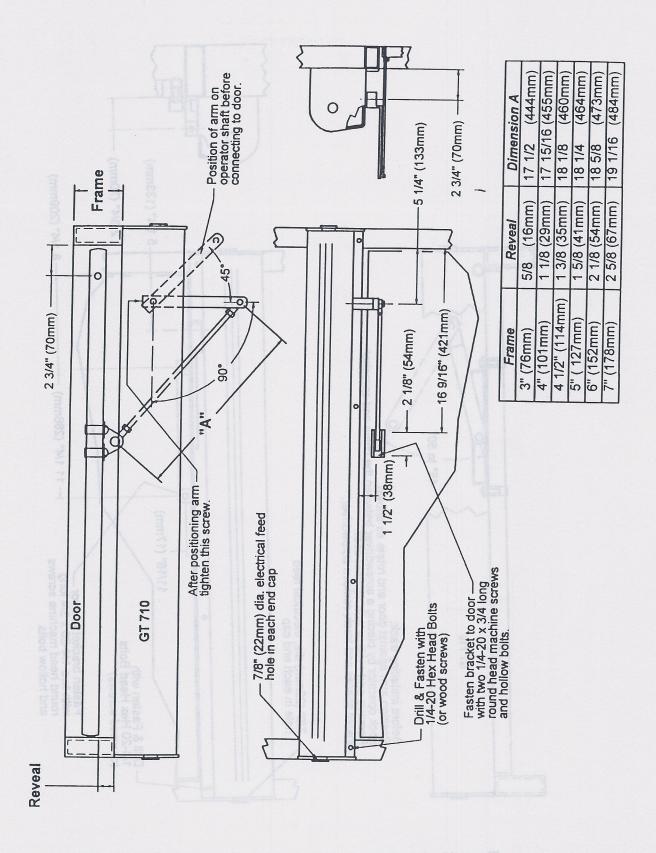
Installation Details, Right Hand Outswing Center Pivoted.
